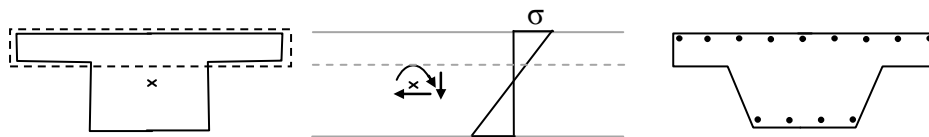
A bridge deck slab modelled with orthotropic shell elements that only have stiffness in transversal direction of the bridge deck slab, and a girder modelled with beam elements with a T-cross-section.
